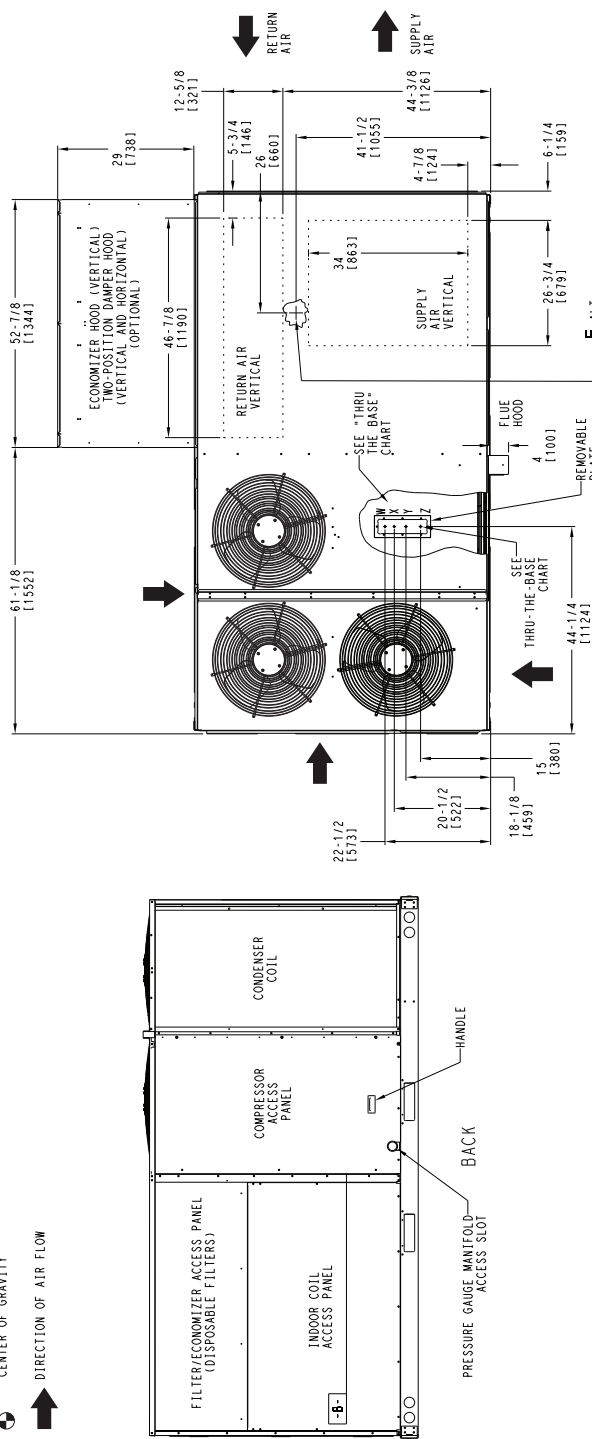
Unit Dimensional Drawing — Sizes 14 (cont)
